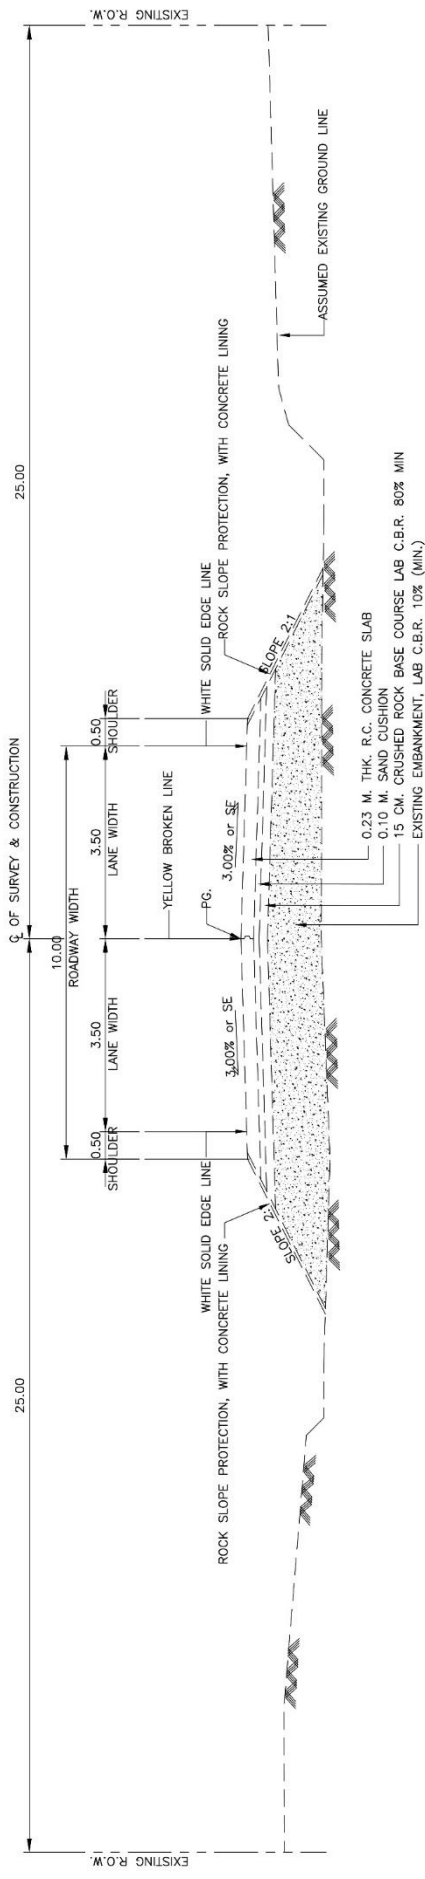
Typical Section of Sta. 133+945 - Sta. 134+678 (No Improvement)
